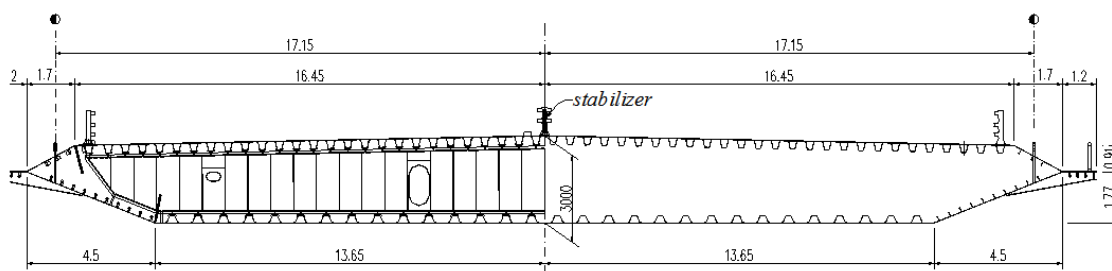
Deck cross-section of the Jiangsu Runyang South Bridge (Dimensions in m)
